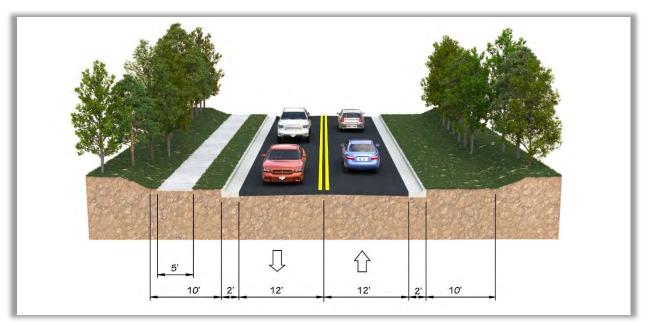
East Frederick Law Olmsted Way Extension Proposed Typical Section
